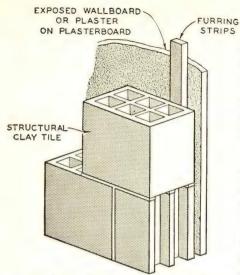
Six-Celled Clay Tile Unit Used in Building Eight-Inch Walls
